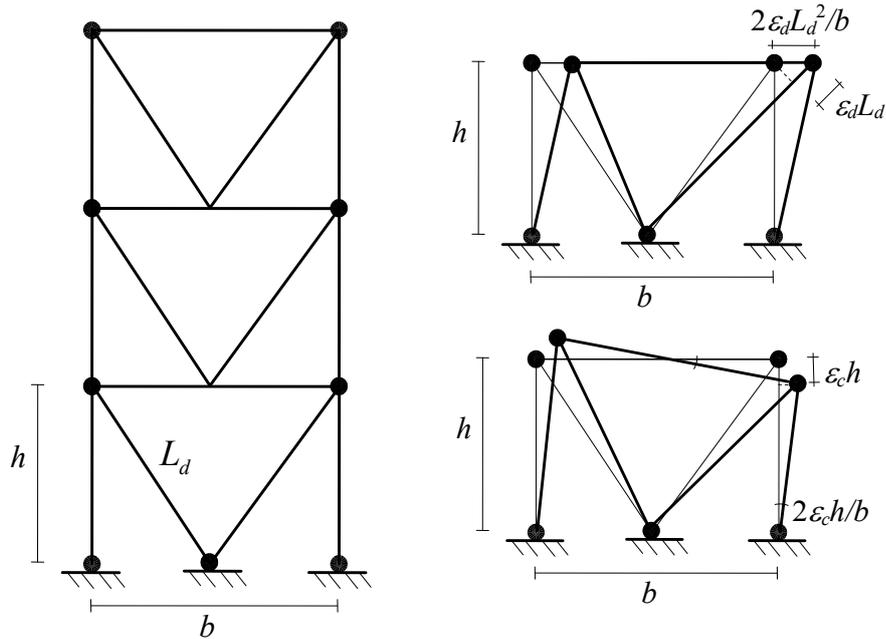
V-bracing system: geometry (a); floor shear deformation and floor curvature (b).
